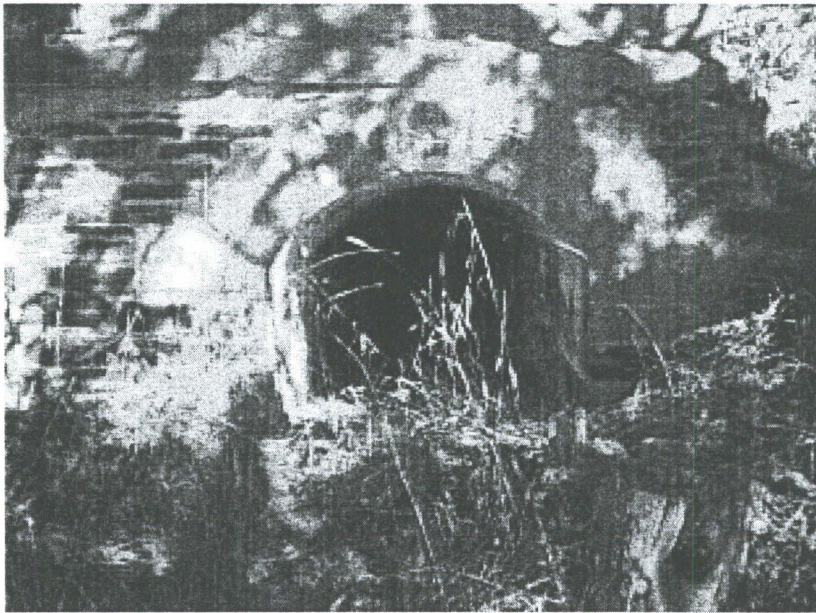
Culvert 4, detail of north face. Arch height 0.49m and width 0.61m.
